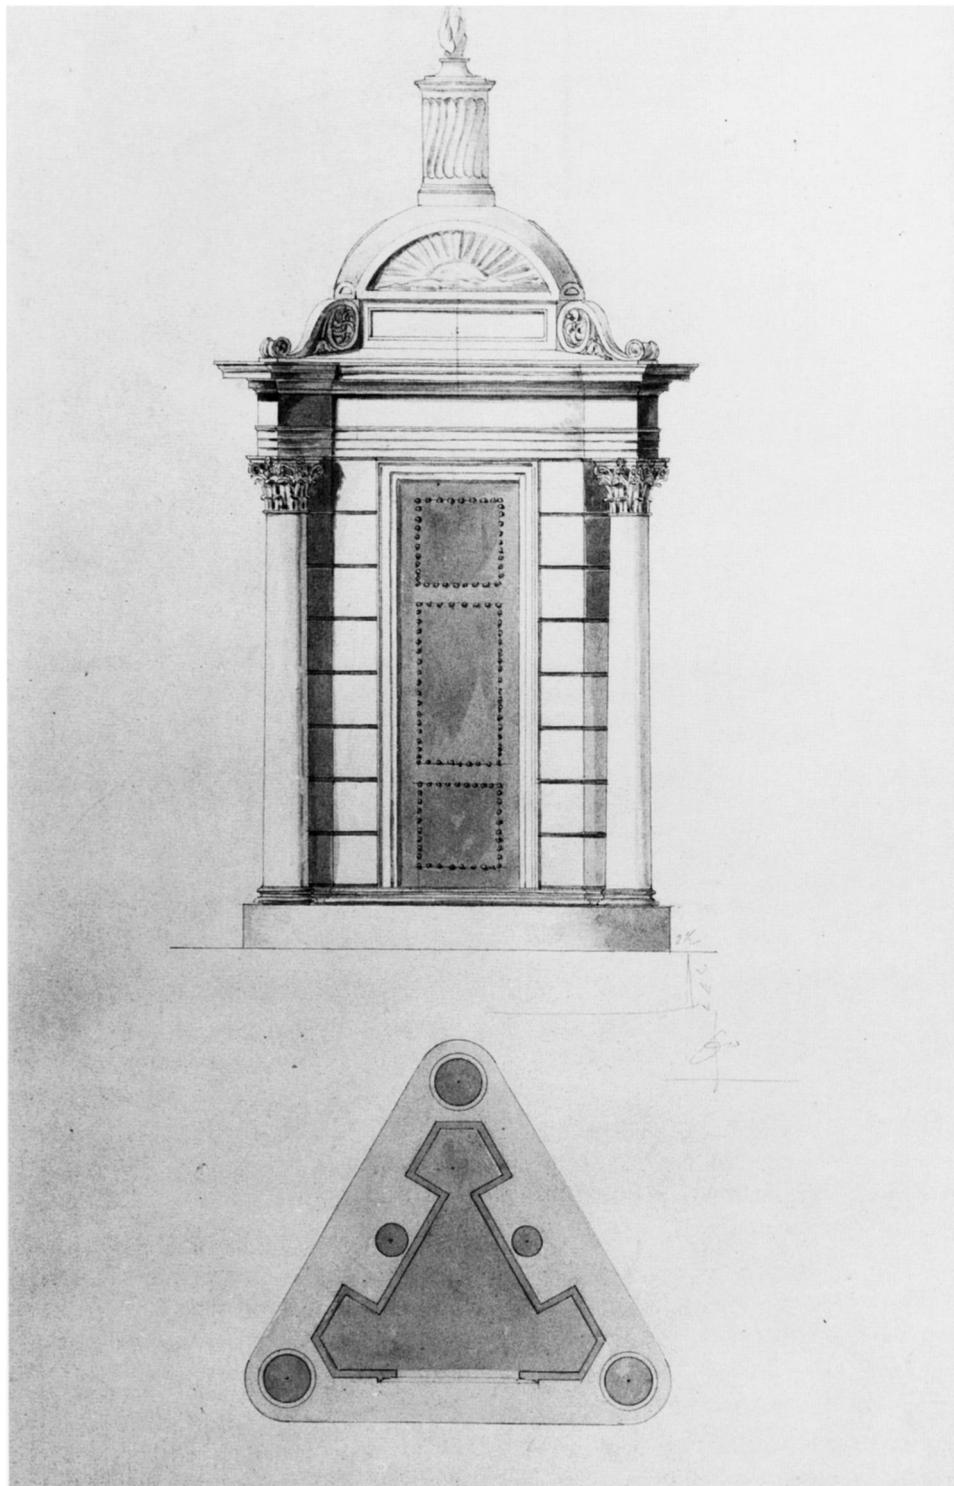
John Soane, design for Masonic ark, 1813, elevation and plan (SM 52/4/3)
